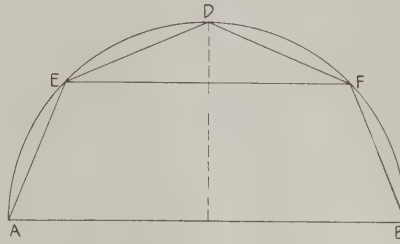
Profile of What Is Known as the American "Curb" Roof
